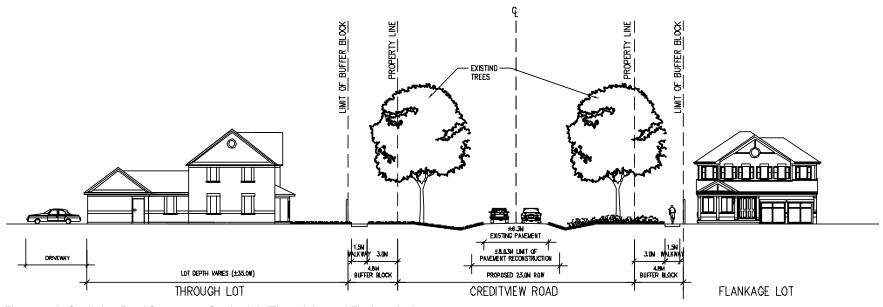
Creditview Road Streetscape Section b-b (Through Lot and Flankage Lot)
